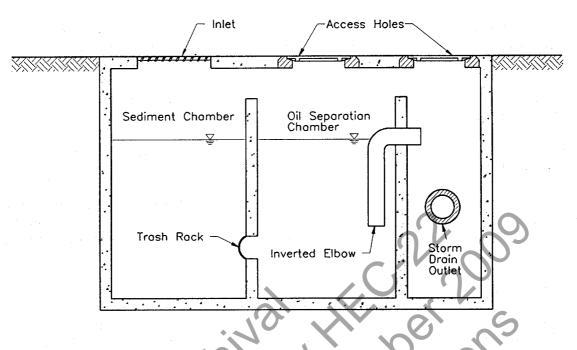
Cross-section detail of a typical oil/grit separator.
